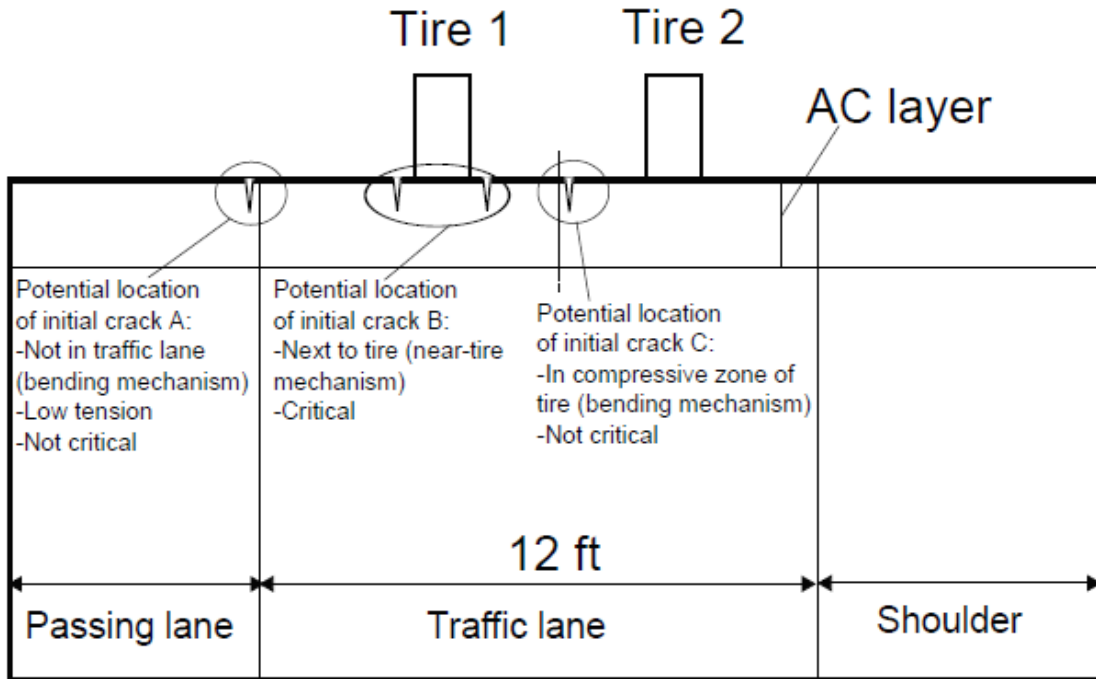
Proposed Top-Down Cracking Mechanisms (Zou and Roque, 2011)
